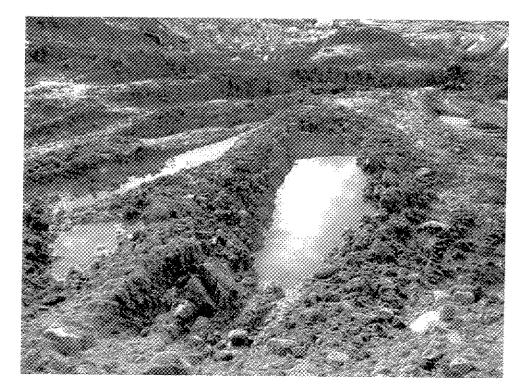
Lagoon Impoundment, looking northwest from southeast corner
